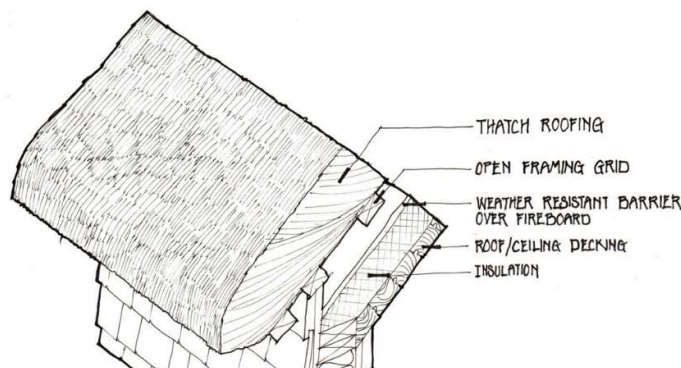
2nd Roof Solution Eaves Detail (20)
